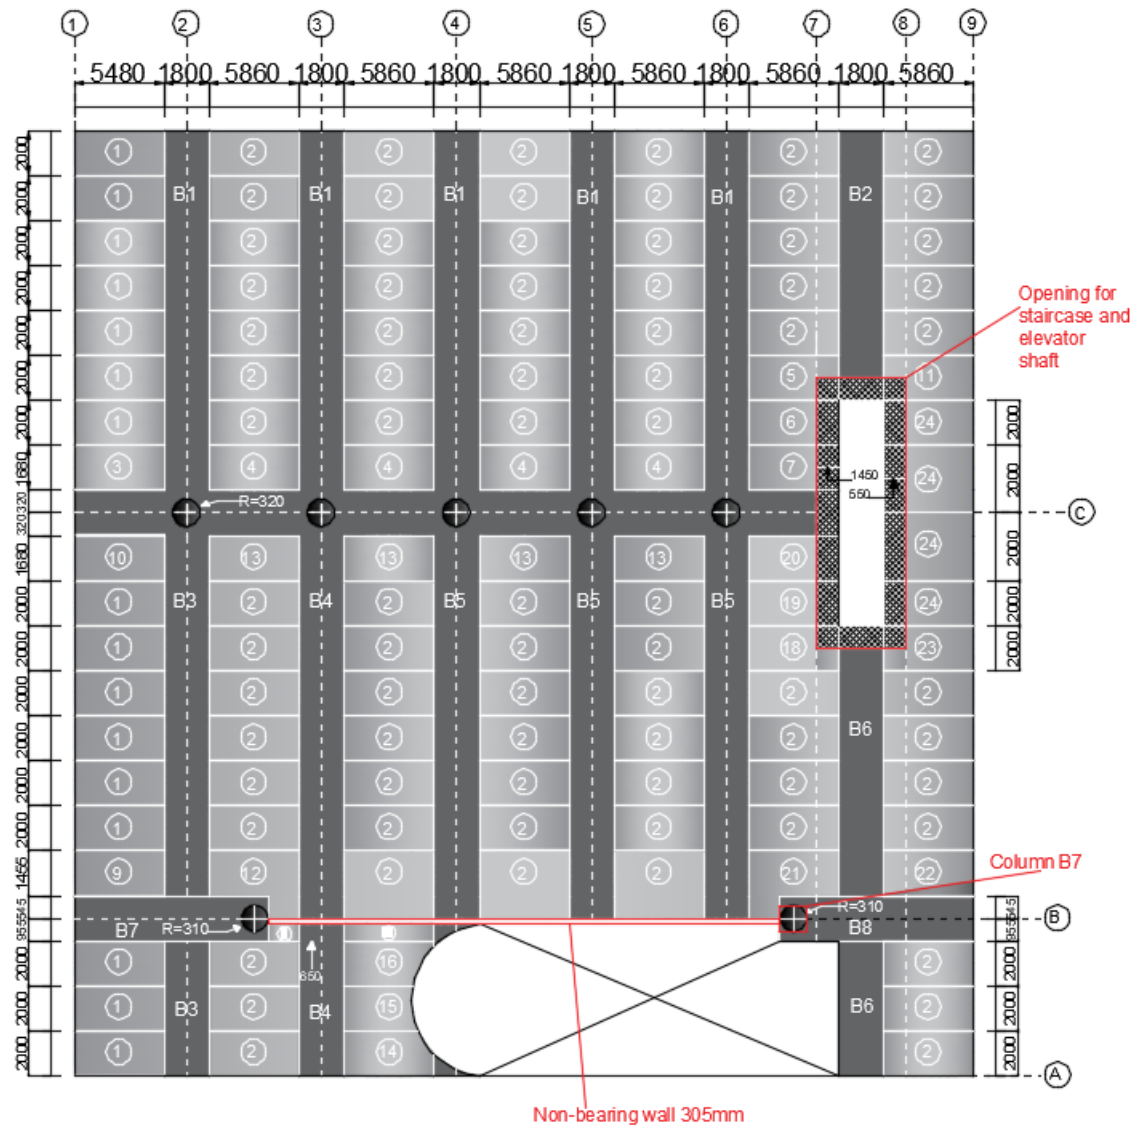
sketch with geometric dimensions of the complete parking lot. Executed in AutoCAD
